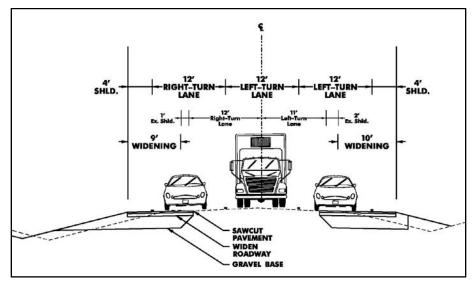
Cross-section of off-ramp showing existing and proposed conditions, looking east
